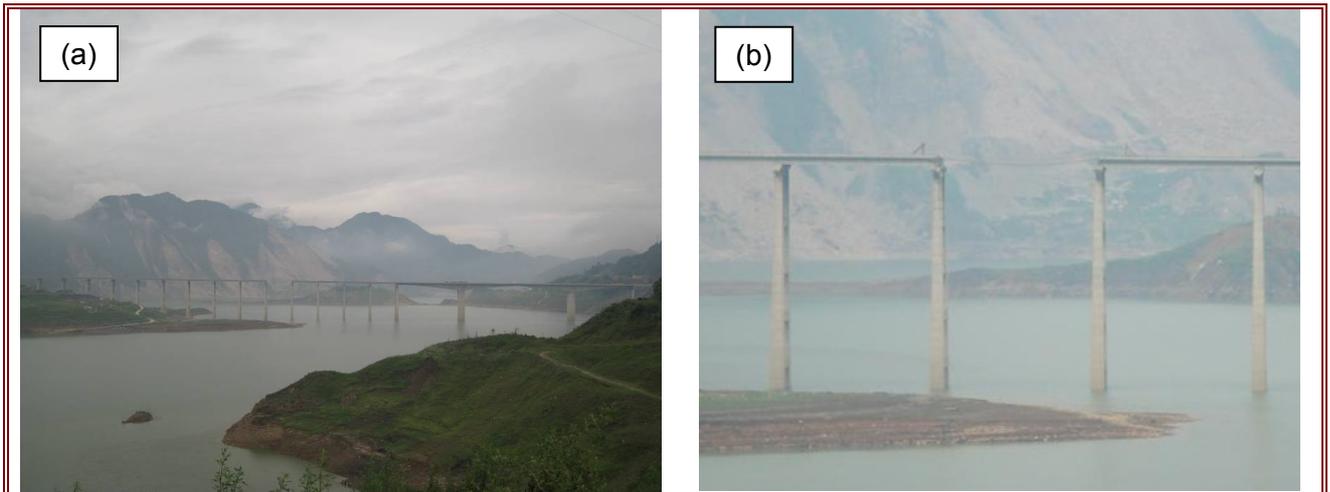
Damaged bridges (a) shows Minjiang Bridge crossing the Zipingpu reservoir where one span is unseated. (b) view of missing span.
